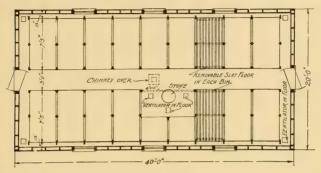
Floor plan of a 20 by 40 foot sweet-potato storage house. (Courtesy, U. S. Department of Agriculture).
